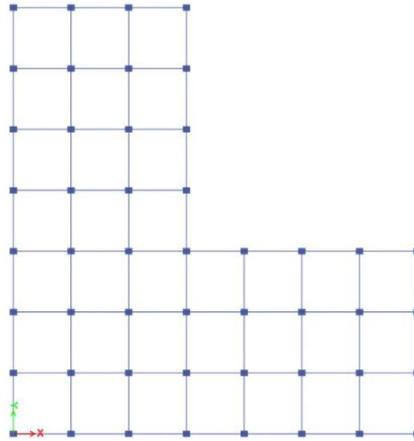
Plan- RC Framed Structures having L Shape Geometry Shape
